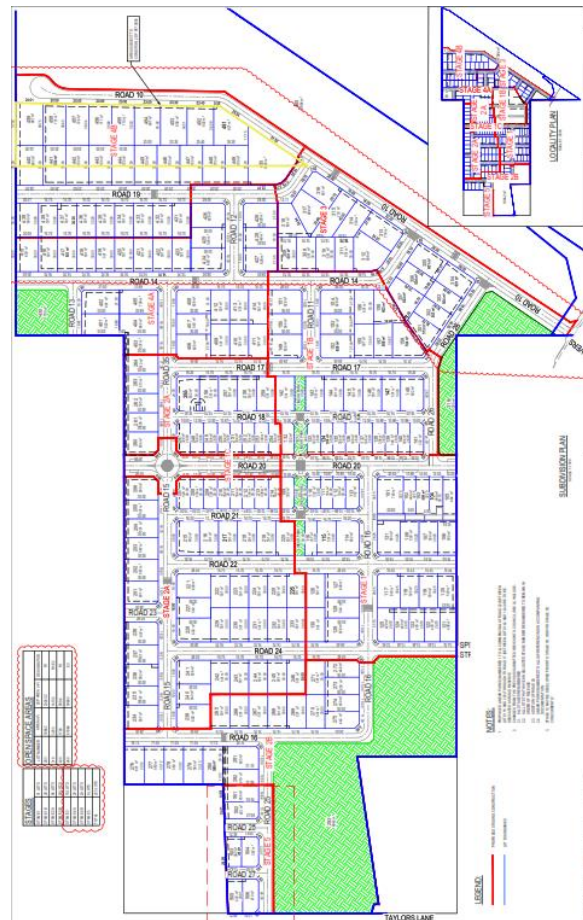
Proposed subdivision plan for DS23/1169 (Plan provided by VPA applicant).
